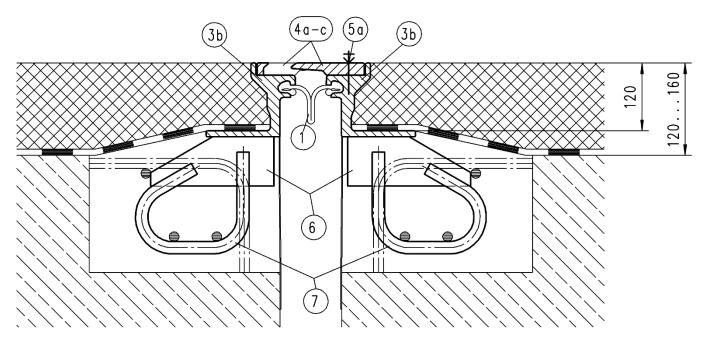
Exemplary cross section of the nosing expansion joint MAURER XC1 Expansion Joint with edge profile XC1/120 including anchorage, pavement thickness 120 mm
